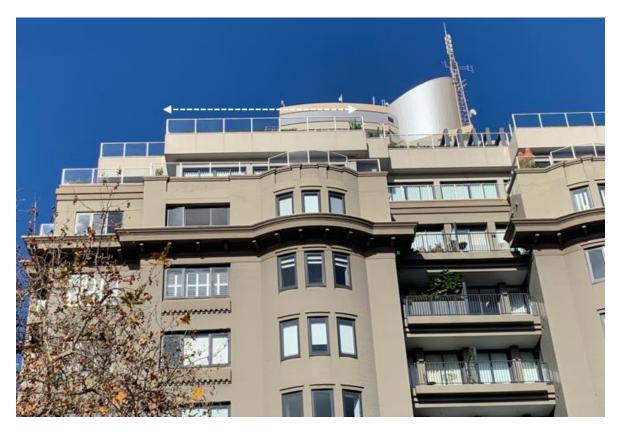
Location of subject terrace as viewed from Bayswater Road.
